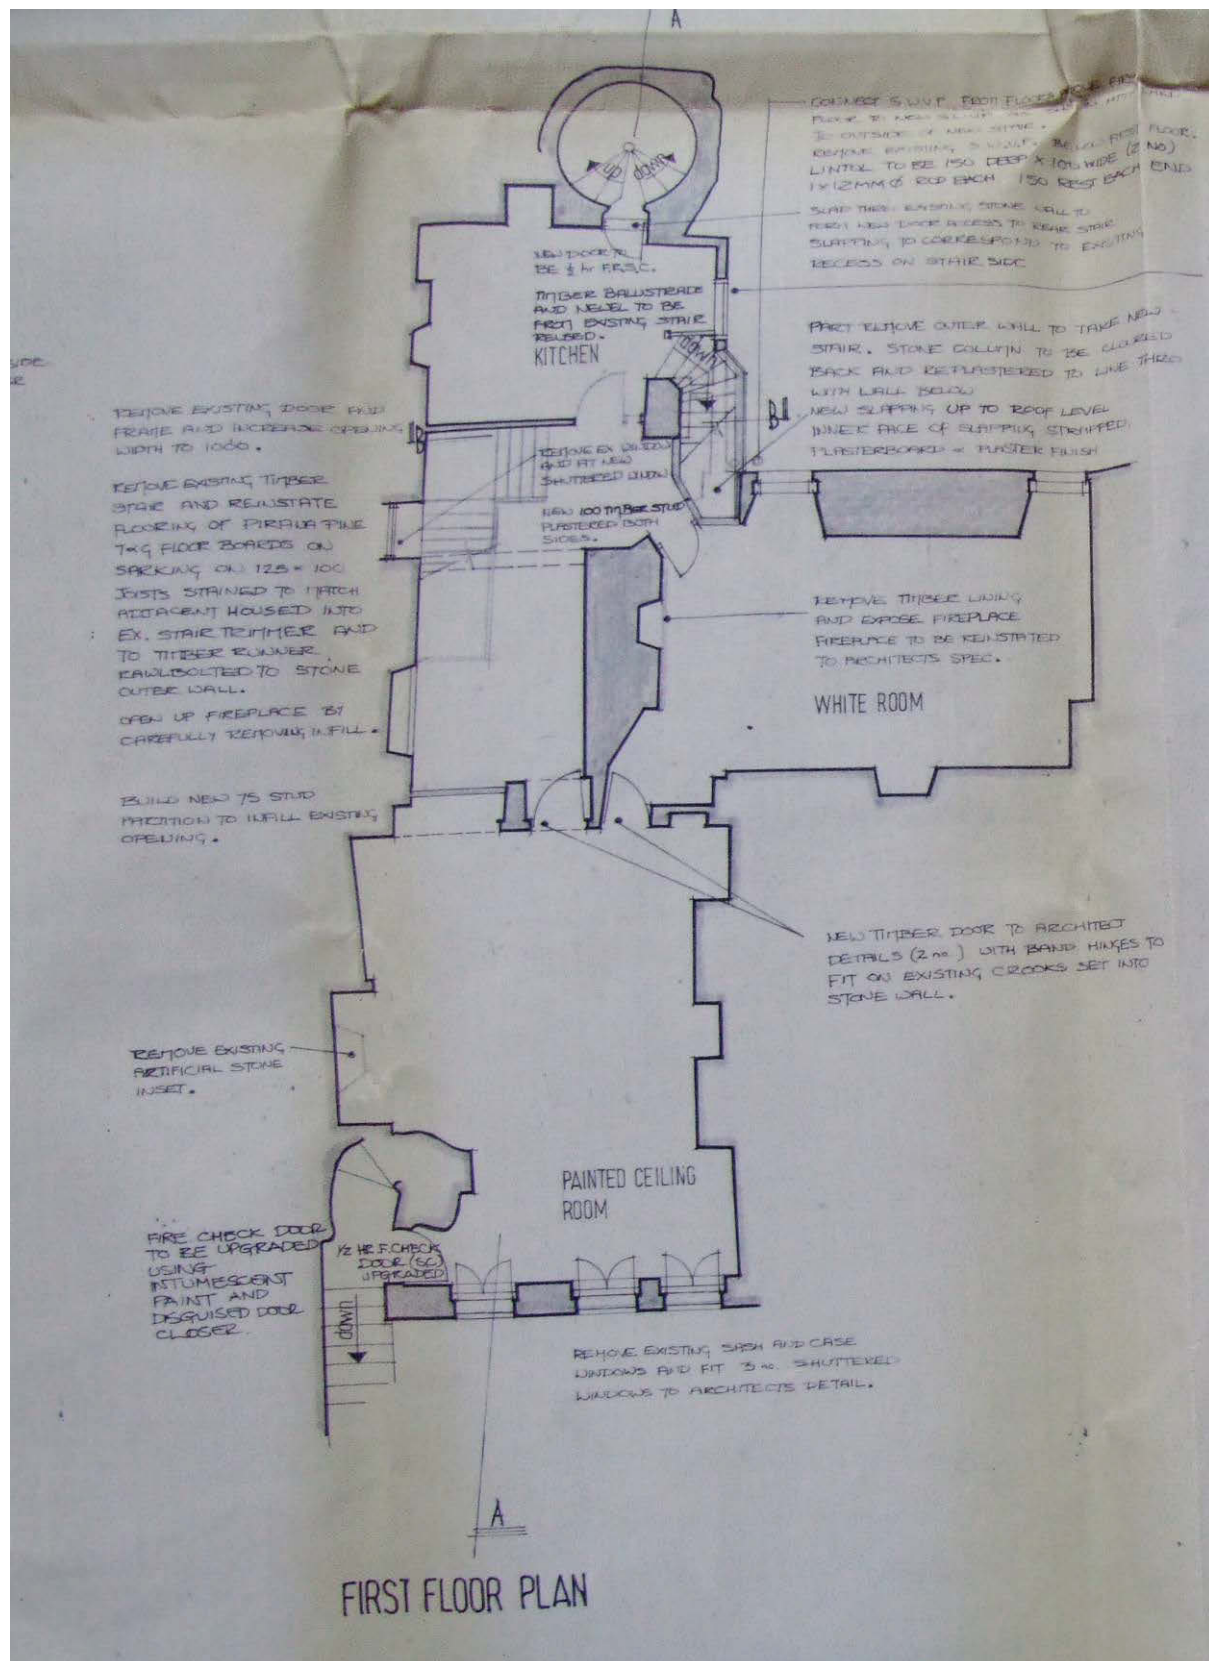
Plan showing alterations scheme for first floor by Robert Hurd & Ptns. Granted building warrant September 1978. City of Edinburgh plan store
